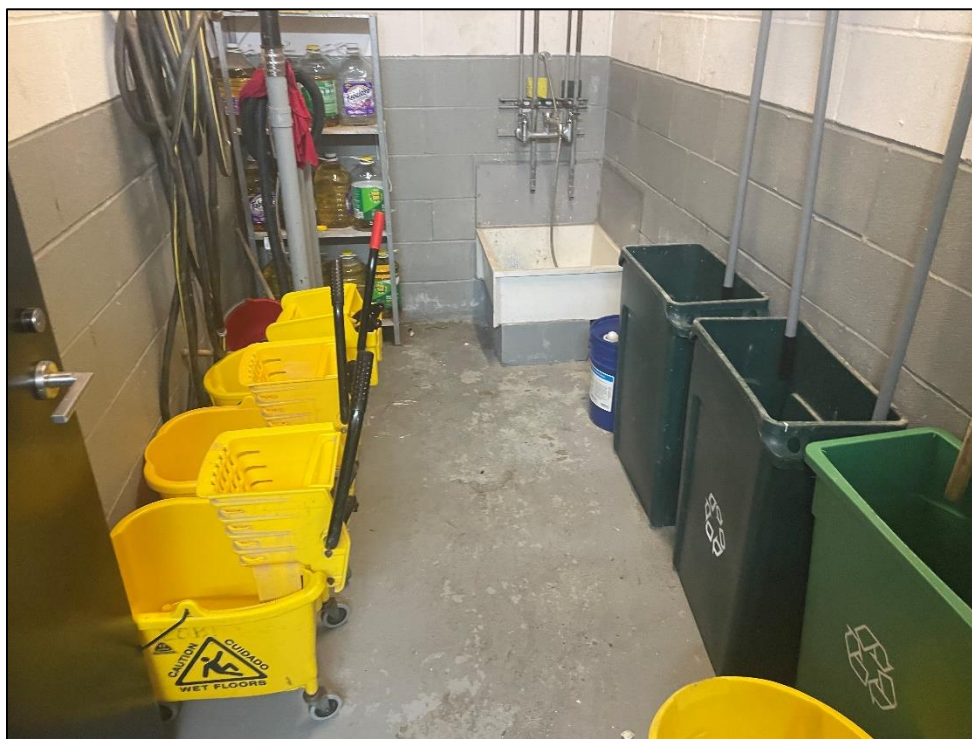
, 05/17/2023: View of composite cover in the janitorial closet (facing north).
